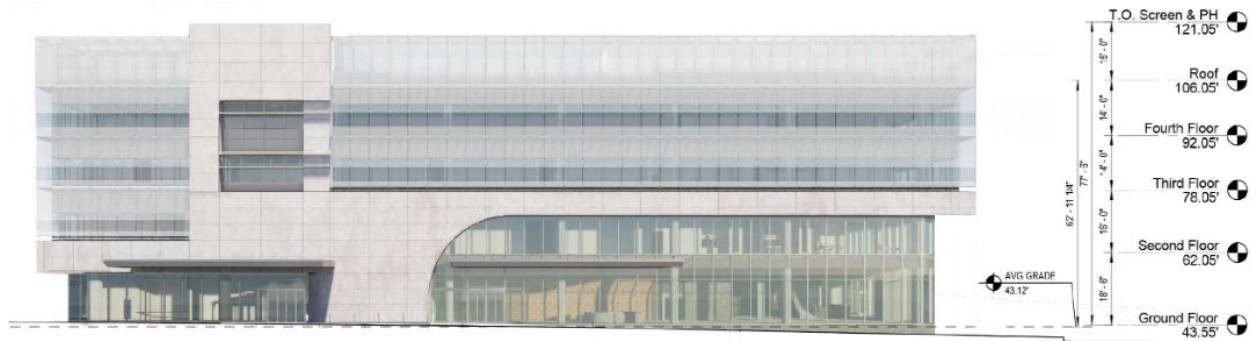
Route 1 South Elevation (as seen from Fannon Street).
